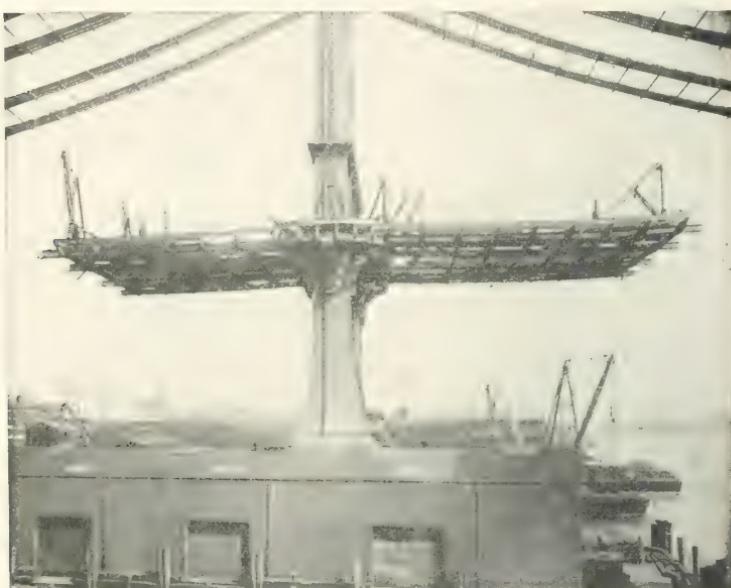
Manhattan Bridge. Erection of Lower Chords and Floor System.
